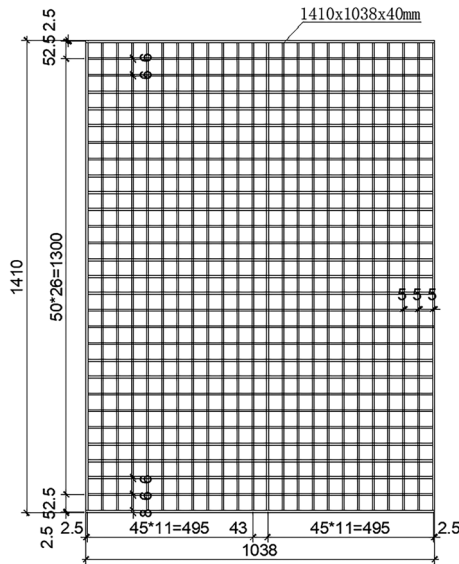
No. 1 grille steel plate (unit: mm)
